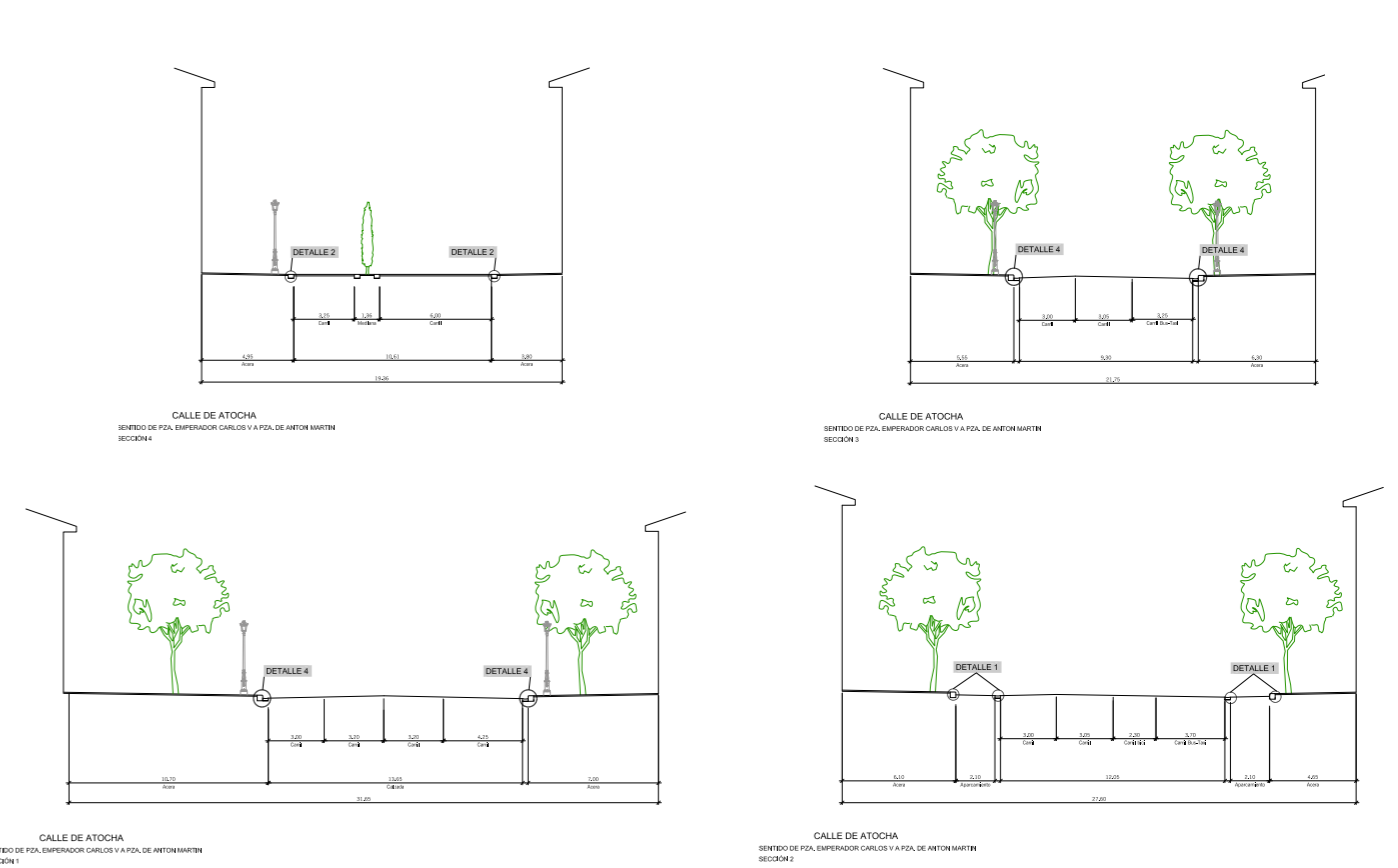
Standard cross-sections for Calle de Atocha. Sections 1, 2, 3 and 4 - Source: Ayuntamiento de Madrid
